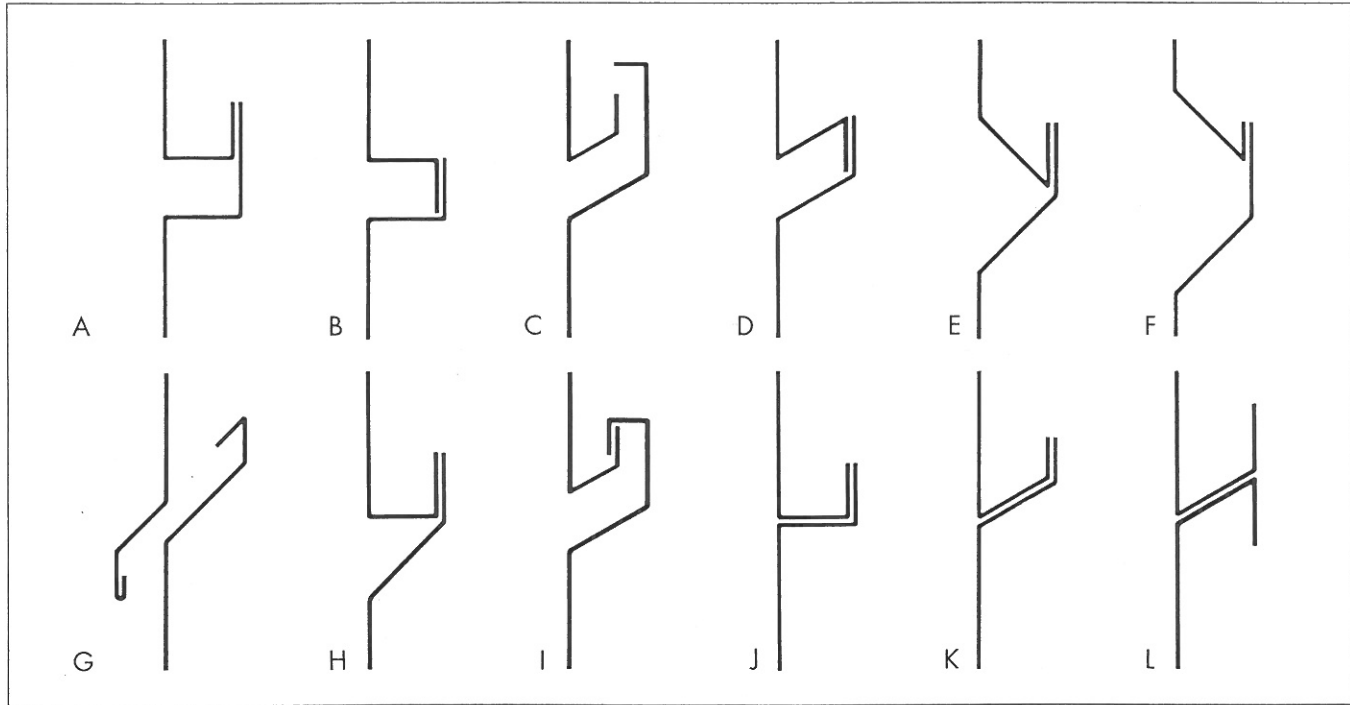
Examples of horizontal joints, schematic drawing. The method of anchoring, the technique used to manufacture the panel and the panel's largest dimension (in order to obtain the necessary rigidity) influence the depth of the panel. The panel depth is generally 20...50 mm. Solutions J, K and L are butt joints which must be designed and implemented paying particular attention to preventing thermal movement from damaging the panels and fasteners. It must be noted that if the edge of the upper panel is mounted flush with the lower panel, as in solutions B and D, the joint does not provide leeway for thermal expansion
